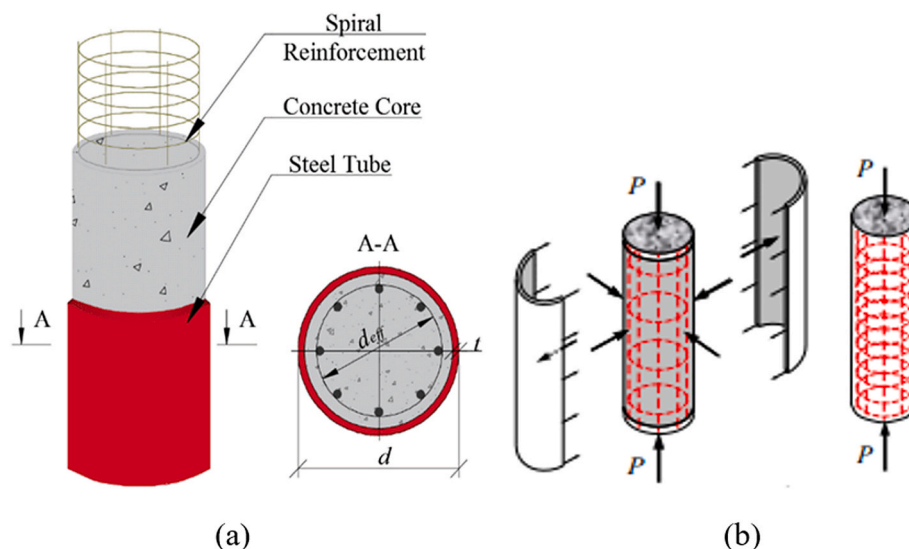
(a) RCFST column; (b) Confinement by hoop reinforcement and steel tube [8].
